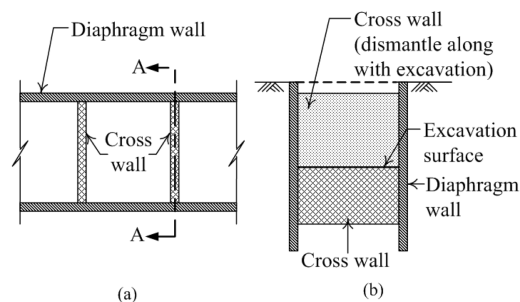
Schematic diagram of cross wall (a) plan (b) section.
